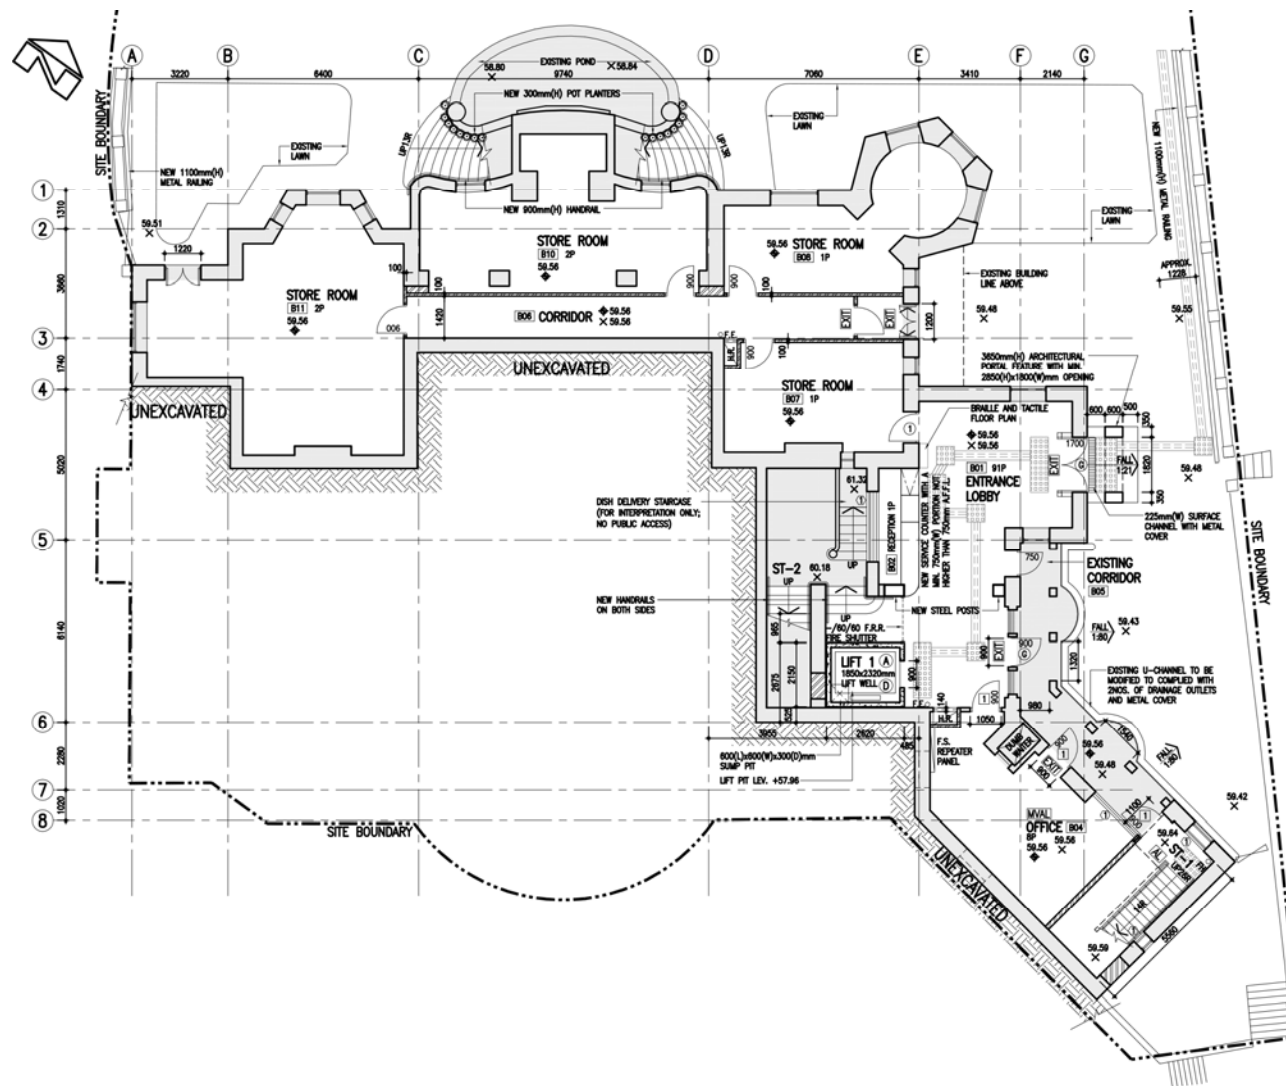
Proposed Lower Ground Floor Plan of the Mansion (not to scale)
